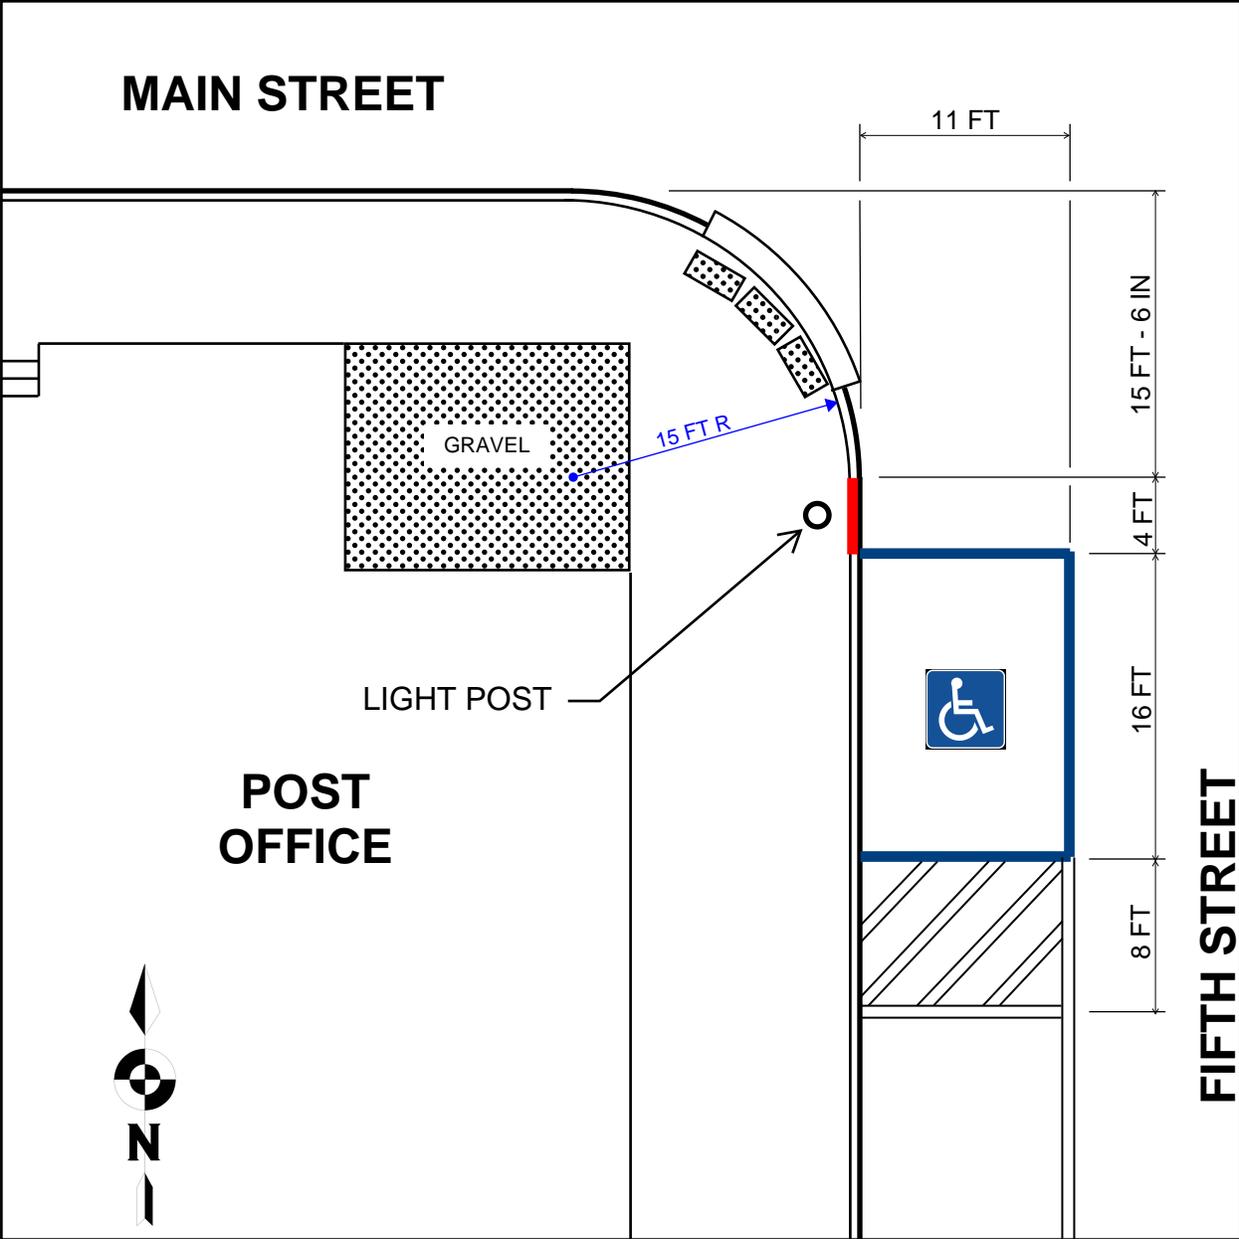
HANDICAPPED PARKING STALL ON THE SOUTHWEST CORNER OF THE INTERSECTION OF MAIN ST. AND 5TH ST.
